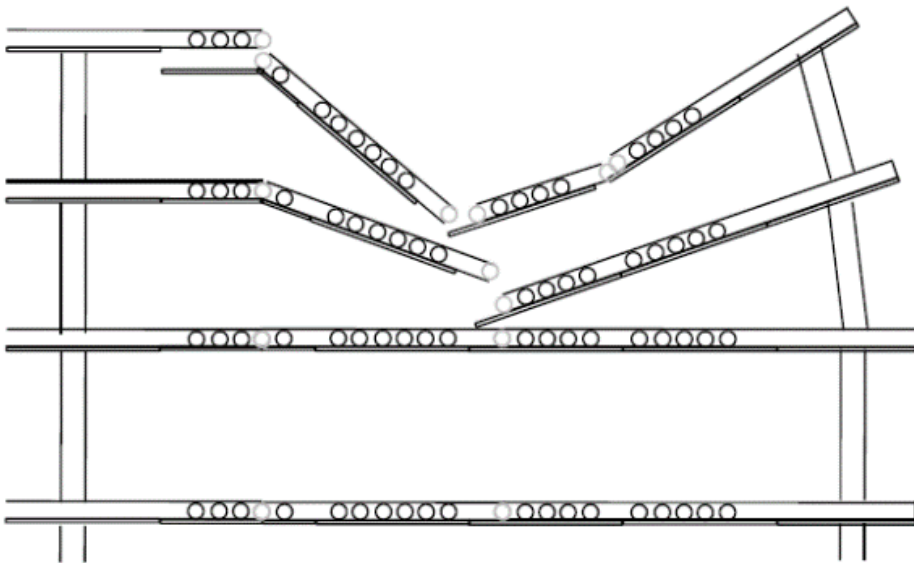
Collapse mechanism due to progressive collapse of the floors, starting at level 4.
